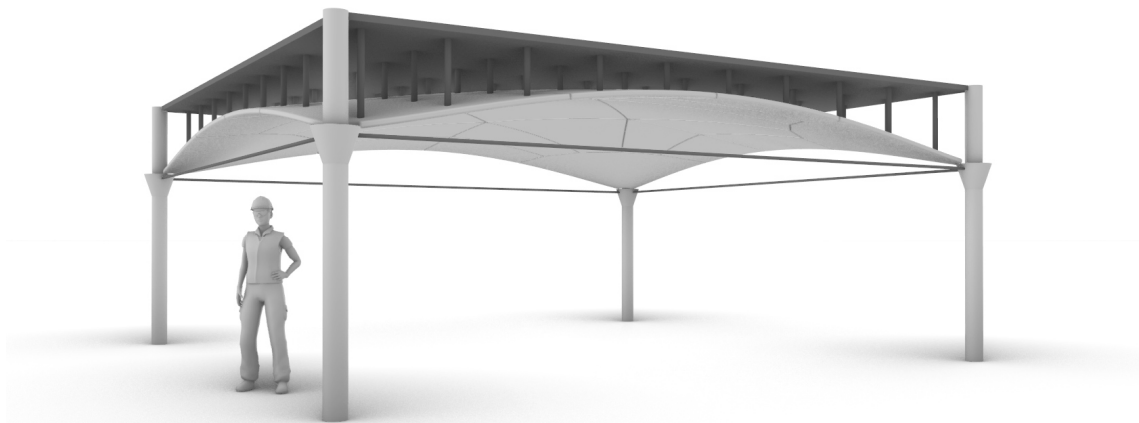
Rendering of assembled thin shell floor system (non-structural flat floor shown in dark grey)
